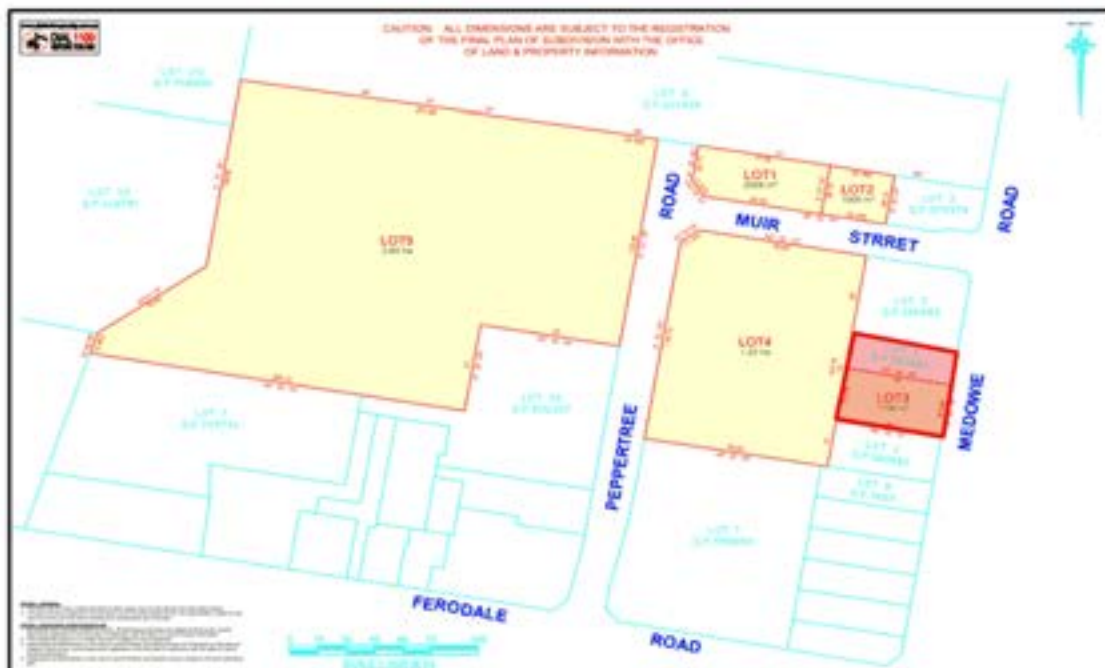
Subdivision Plan at 705 Meadow Road as per Approved DA 16-2018-789-1. Source: LMG - location of the proposed service station shaded in red.
